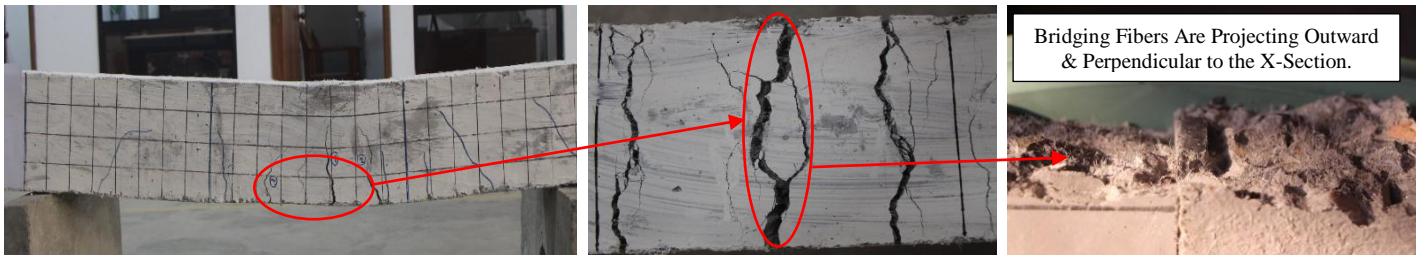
Failure pattern of RC beams containing crumb rubber and PP fiber.
